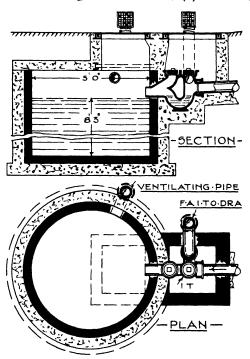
Plan and section of cesspool lined with cement 'cistern rings' to hold 1,000 gall, with drain intercepting trap and chamber.
